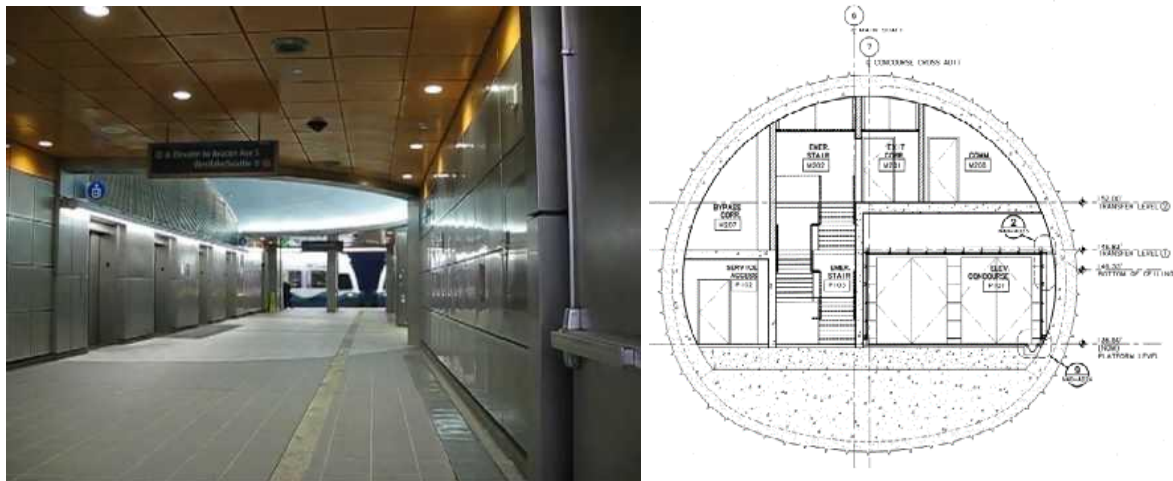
Example of Platform Adit (photo left, typical section right)
